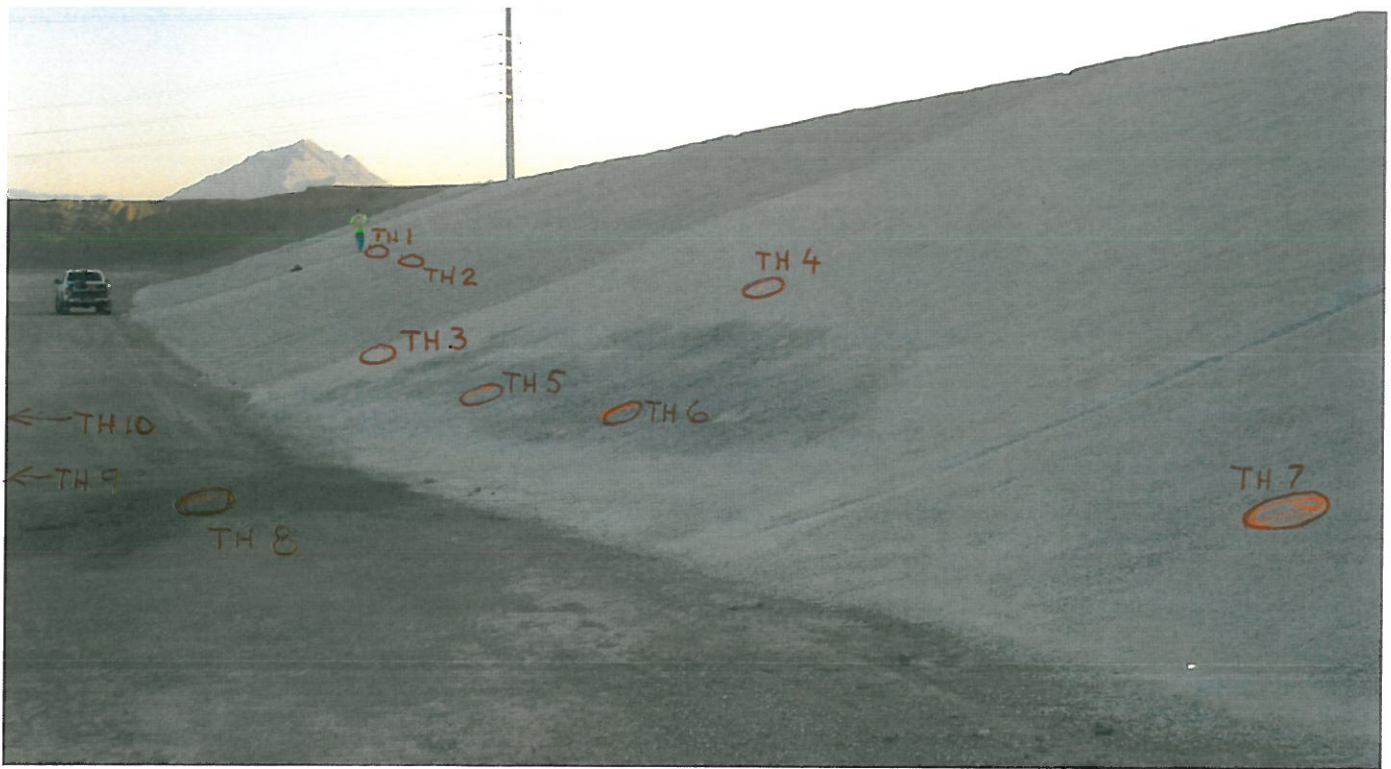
West pond slope discolored area and location of Test Holes 3, 4, 5, 6, 7 and 8.
